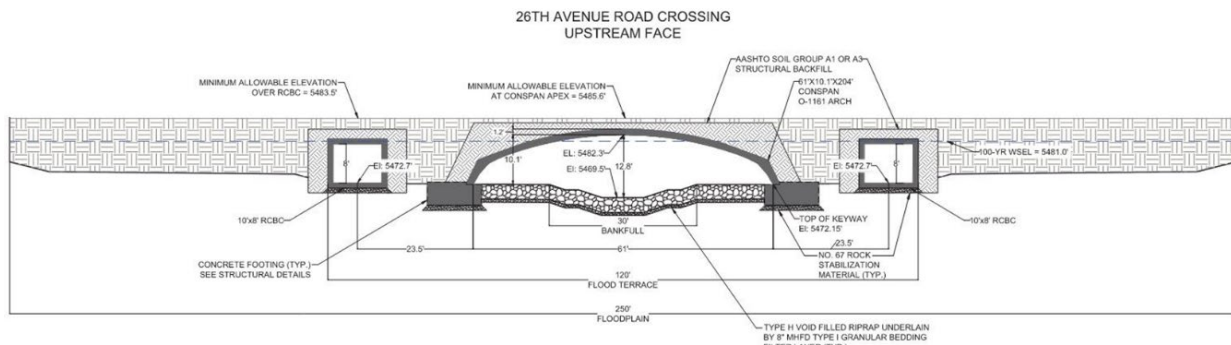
Proposed 26th Avenue Stream Crossing Structure over First Creek
